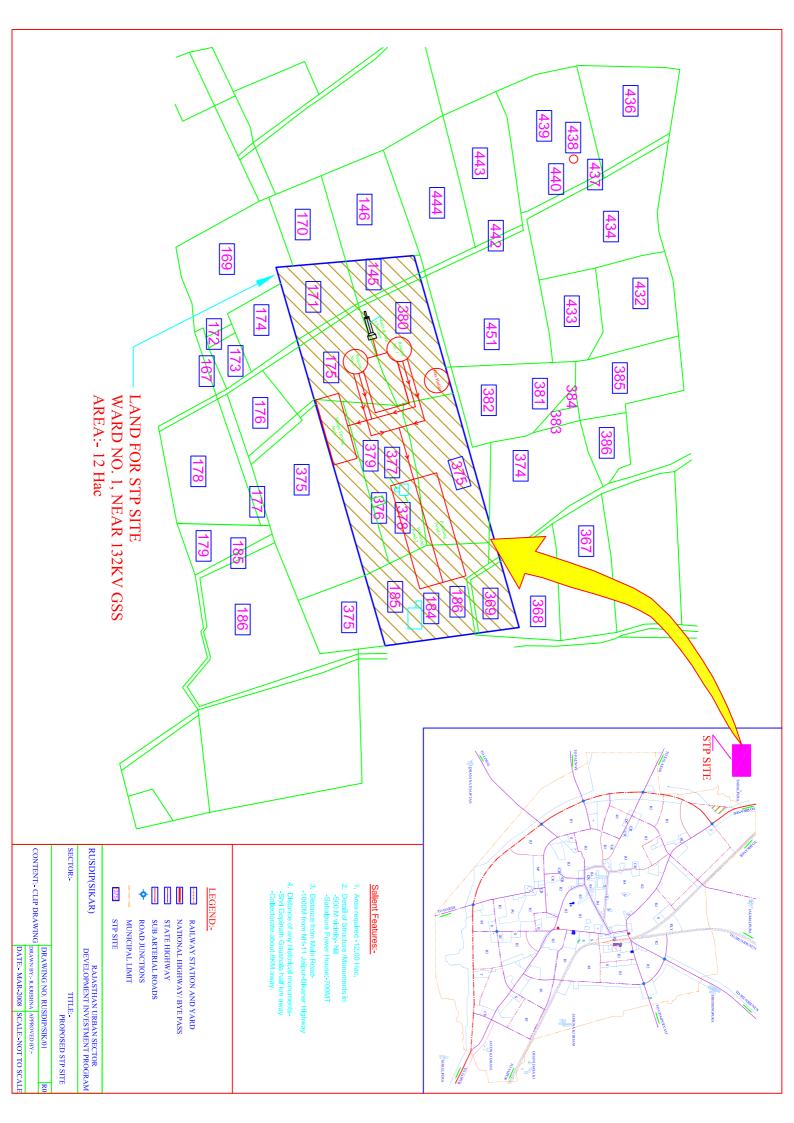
Location of Sewage Treatment Plant in SOI toposheet
